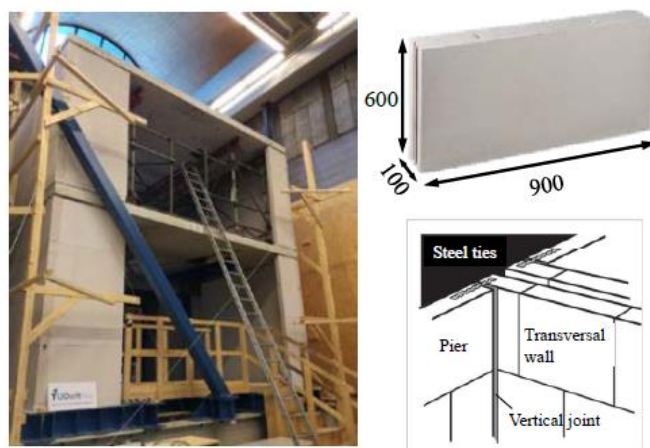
The full-scale specimen of CS element masonry building (Messali and Pari 2017)
